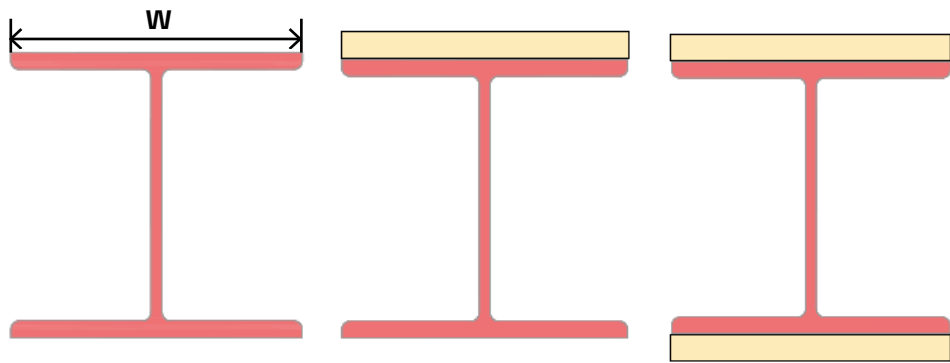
Plan view of Universal Steel Column showing sequence of first layer of Knauf Fireboard to flange side
